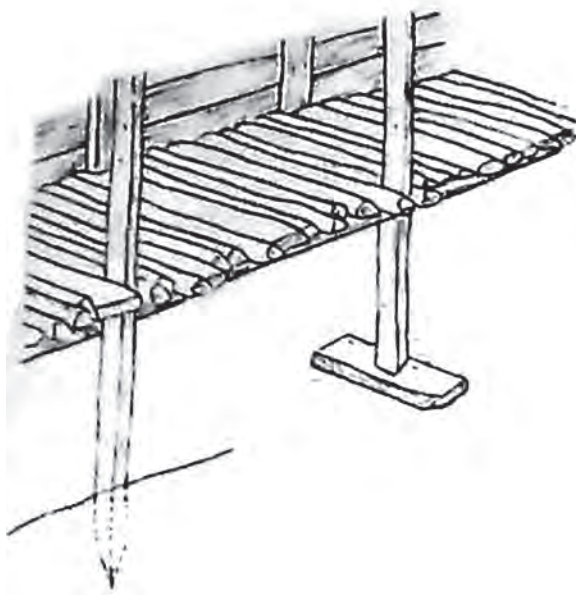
Elevated floor of a pile-dwelling (from Menotti 2012, 134, Fig. 4.3).
